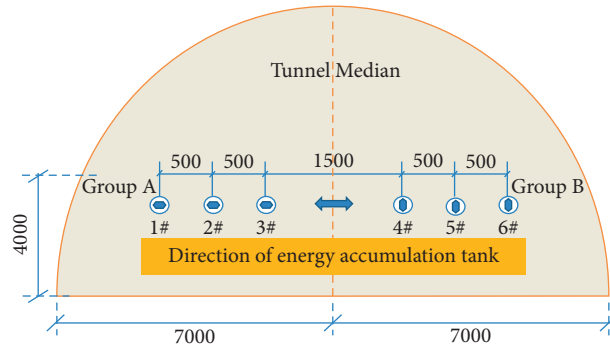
Arrangement of blasting hole in plugging blasting test.
